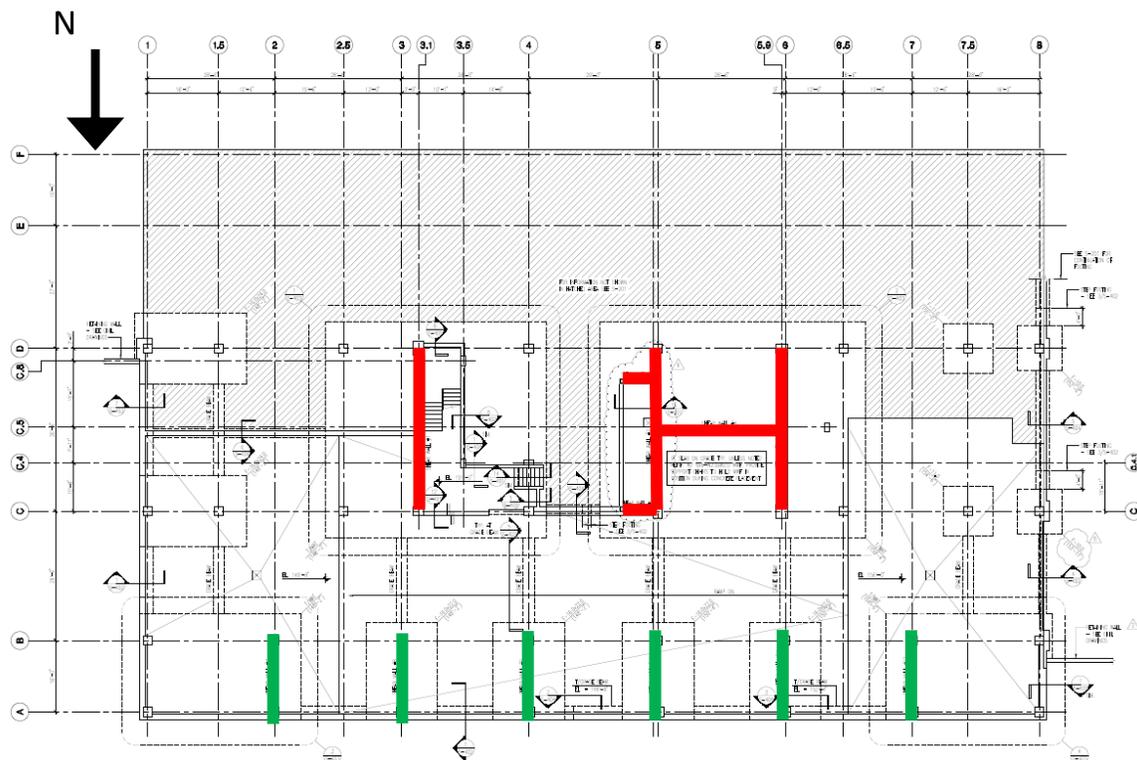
Foundation Plan (Level P0) Showing Shear Walls (Source: Cagley & Assoc. Drawing S-200)
